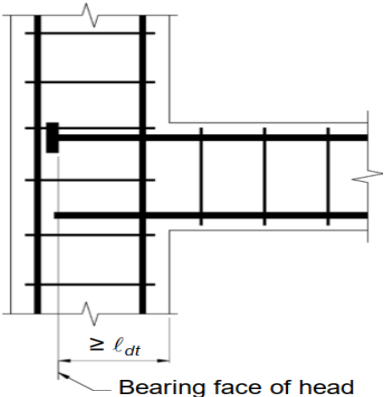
Exterior beam-column joint with headed bars that meet the ACI 318-19 development length requirement (ACI 318-19)
